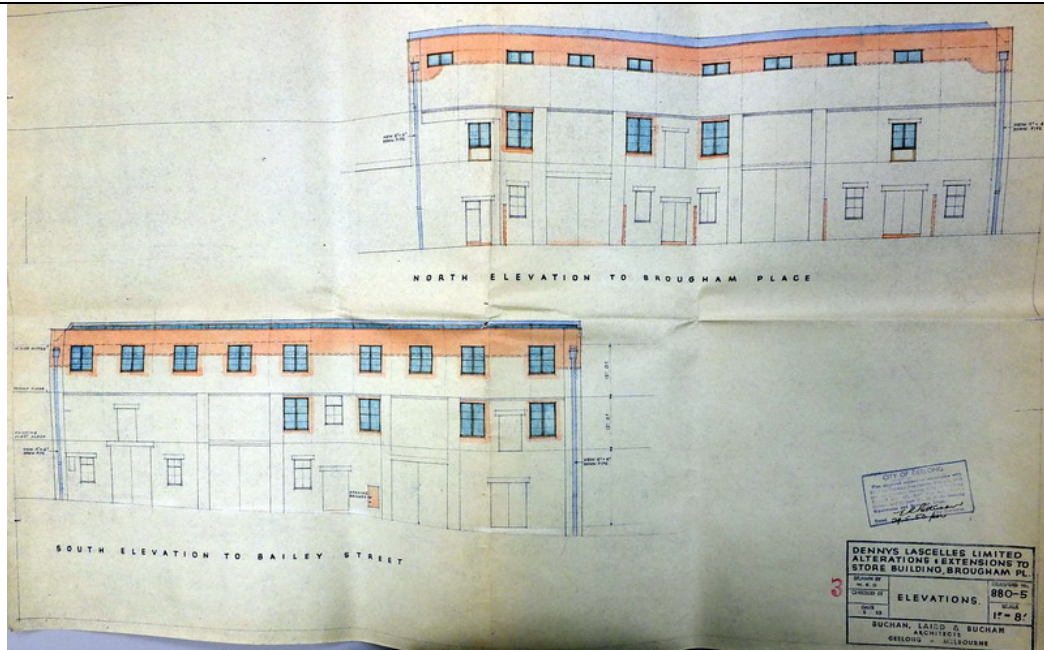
Buchan Laird & Buchan, Elevation drawings, proposed additions to Dennys Lascelles Ltd, 4 May 1953. Source: City of Greater Geelong Building Permit file 6828/53
